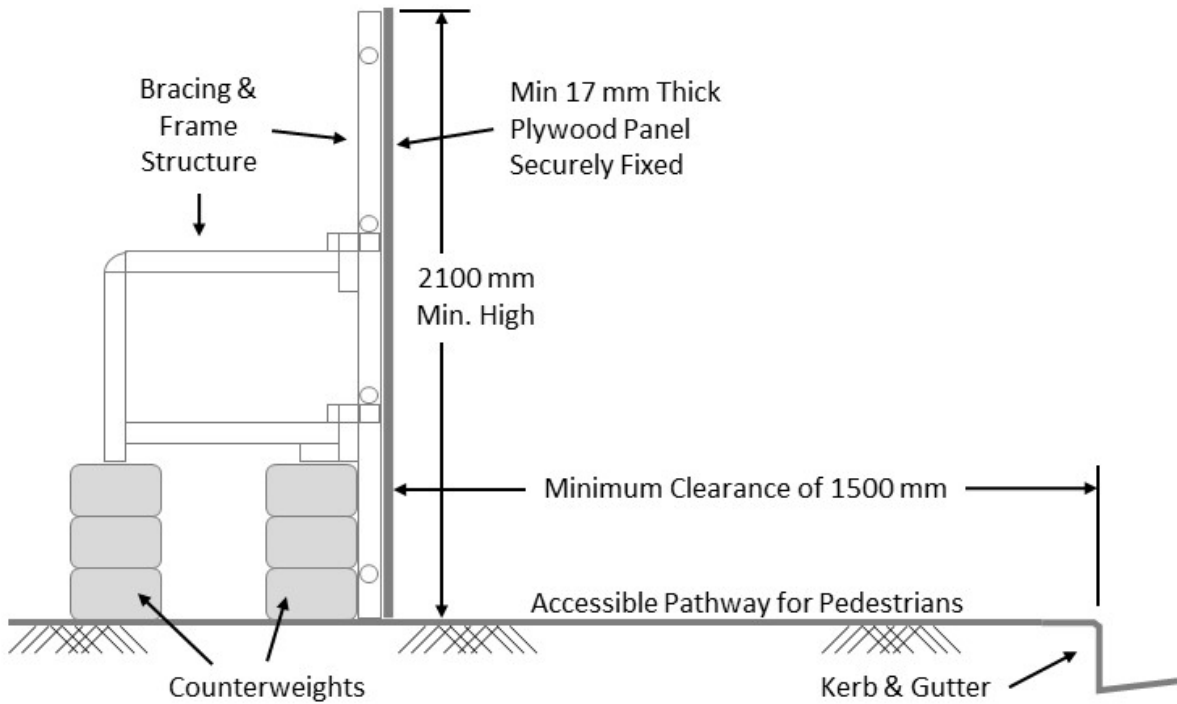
Typical Low Risk Type A Hoarding Section/Detail
